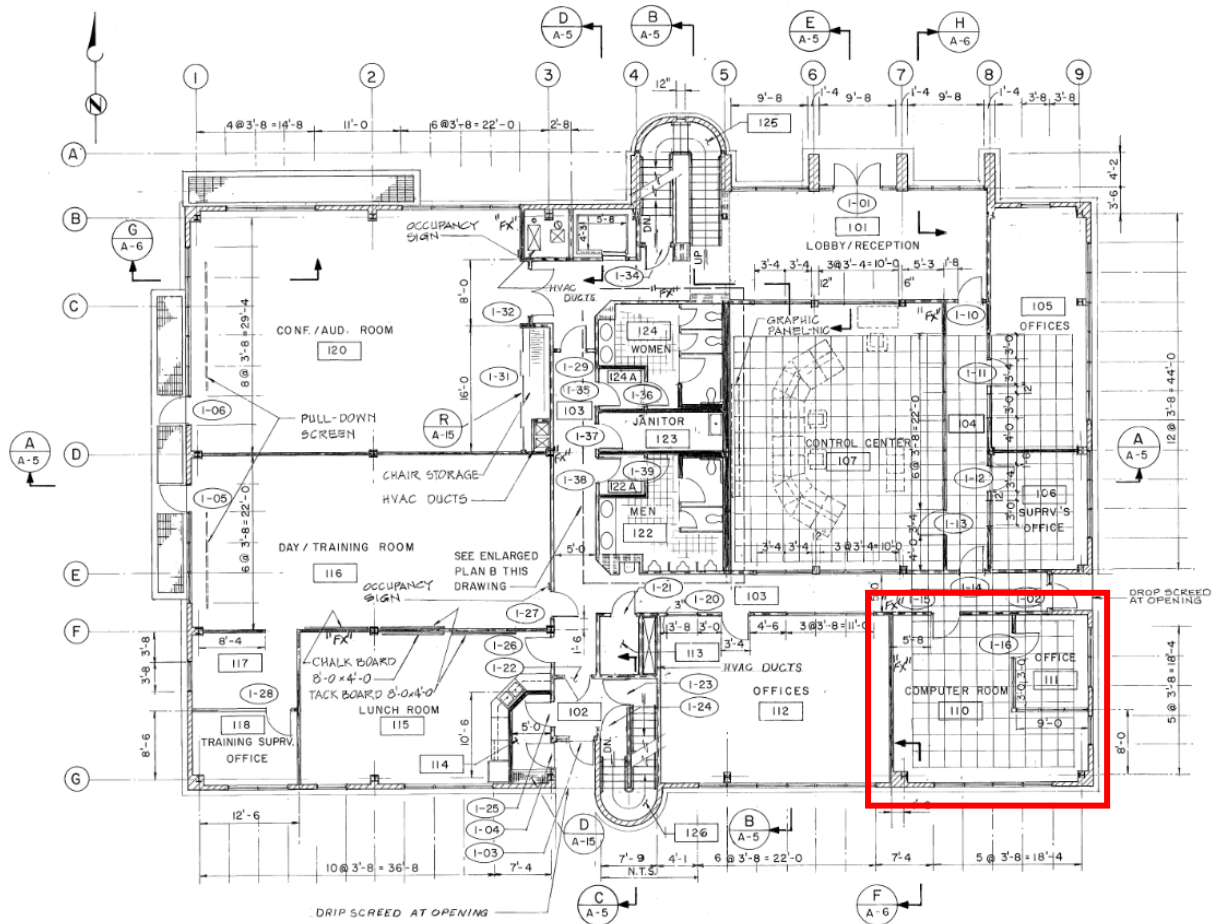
Ground floor plan of Plant 1 Control Center. The server room is inside the red square
